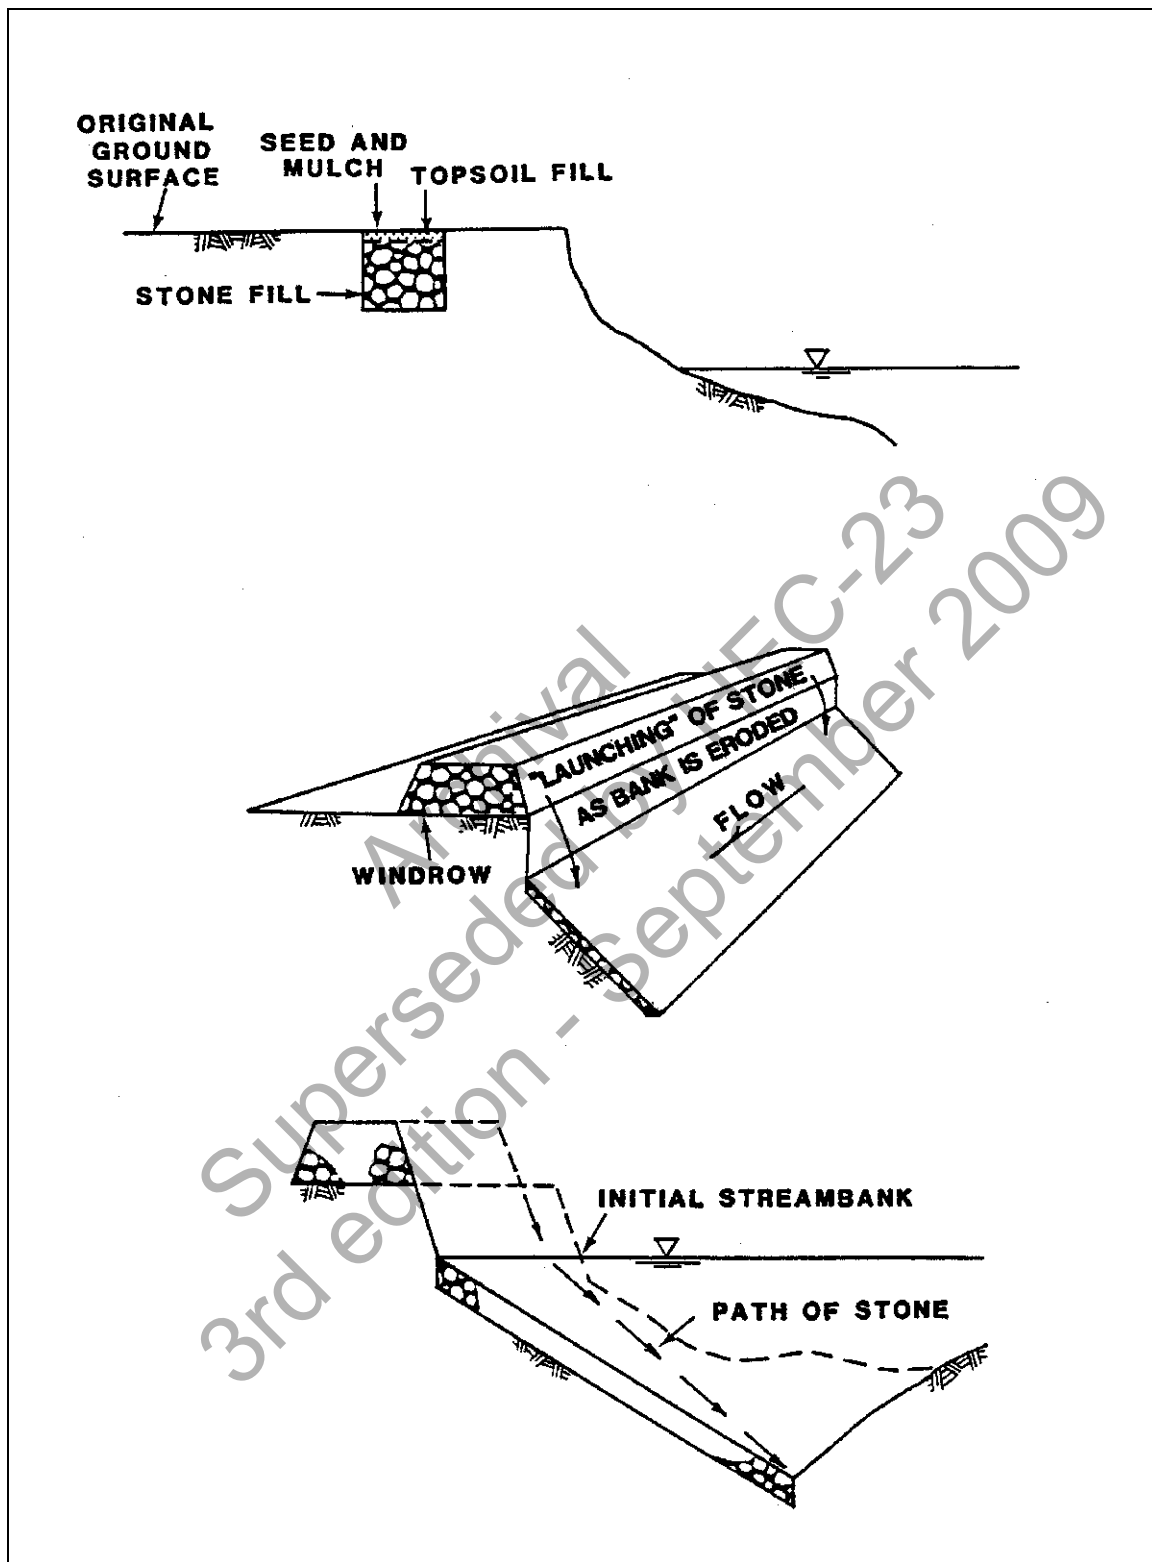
Windrow revetment, definition sketch (after USACE).⁽⁹⁾
